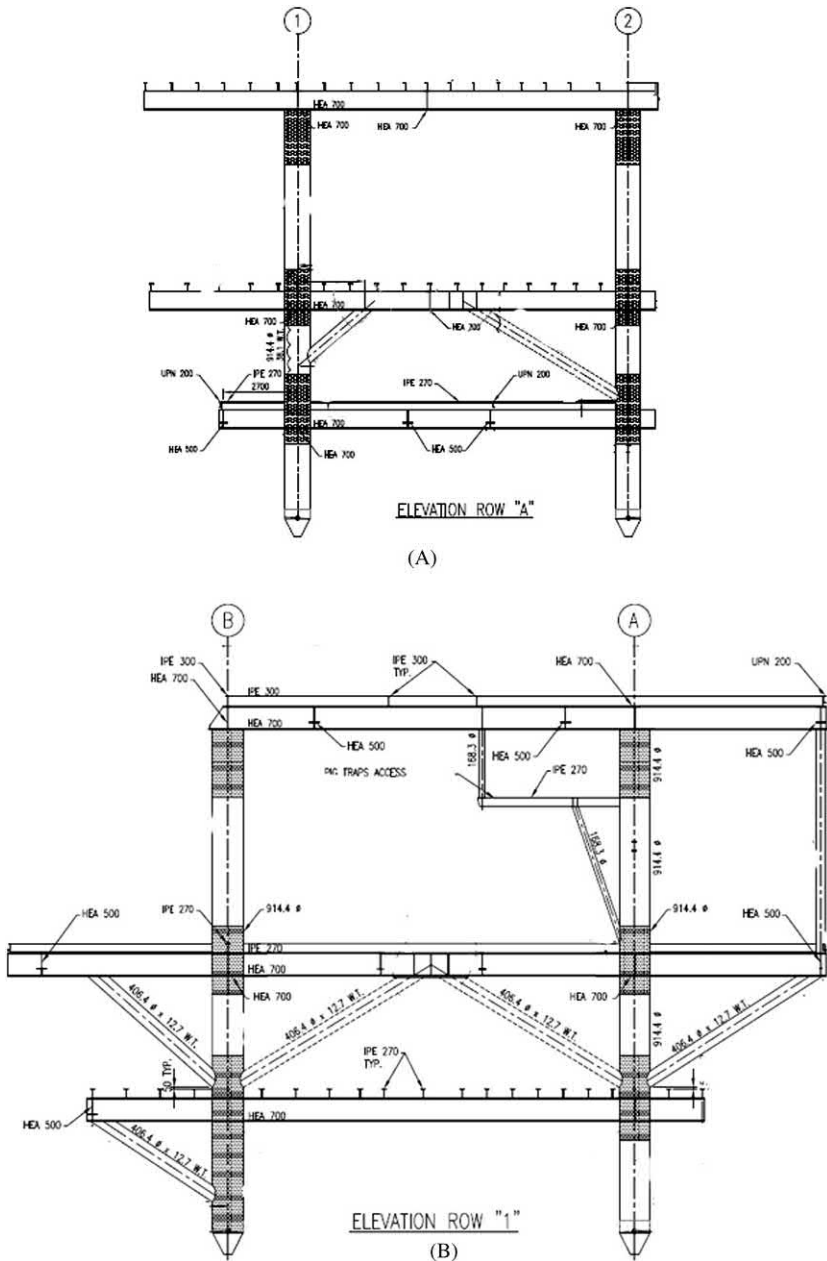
(A) Elevation at row A; (B) elevation at row 1.
